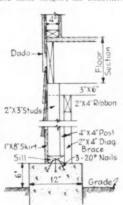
Detail of underpinning a precast pier in a fabricated floor section
